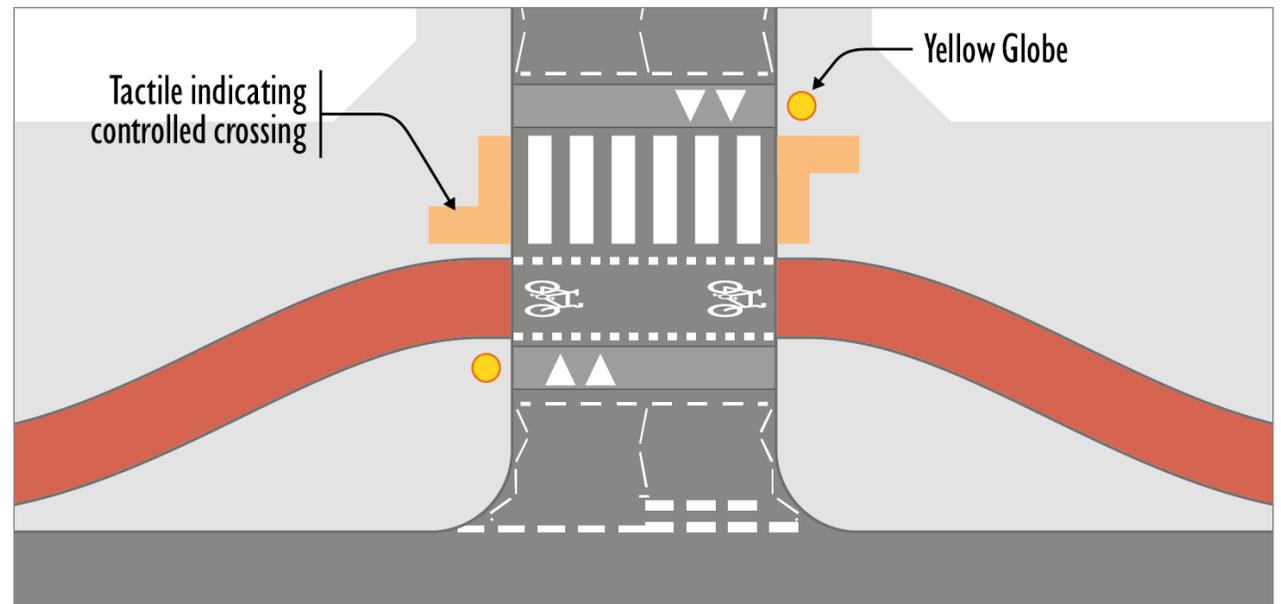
Priority at side road bend-out layout (Parallel crossing)
